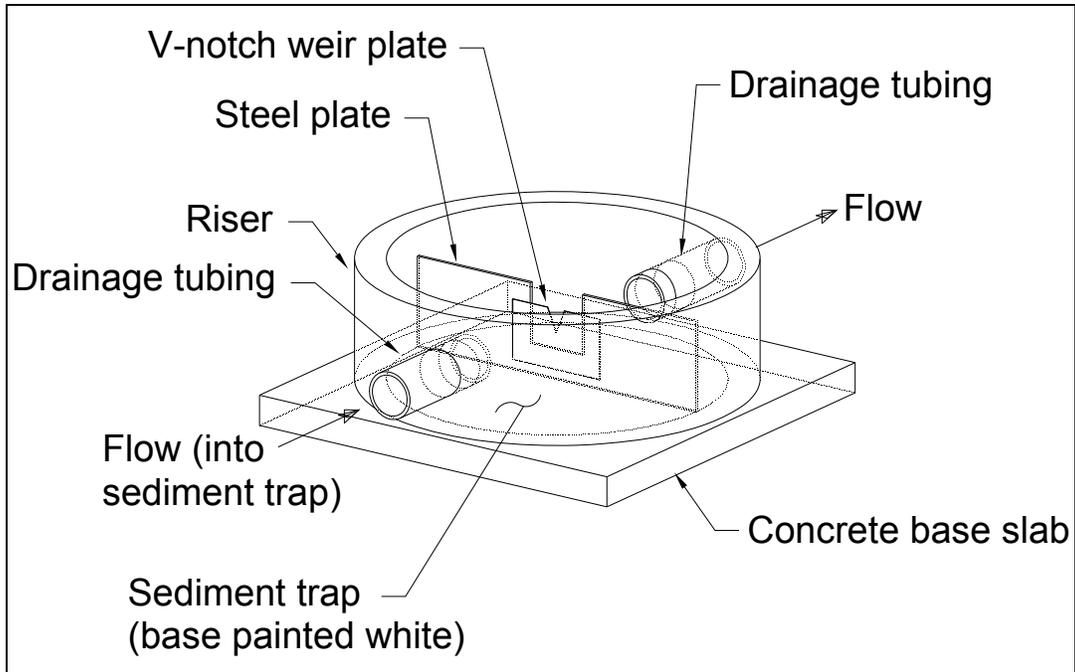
Components in the bottom of a typical inspection well. Optional baffle at the end of the inlet pipe is not shown.
